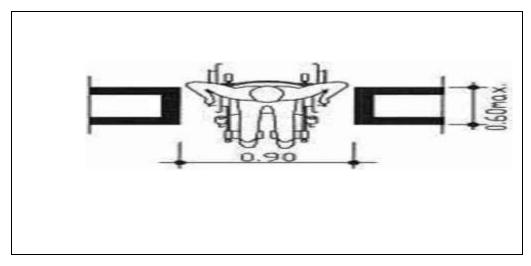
Minimum exterior doors opening size (Source: SOLIDERE, 2004)
